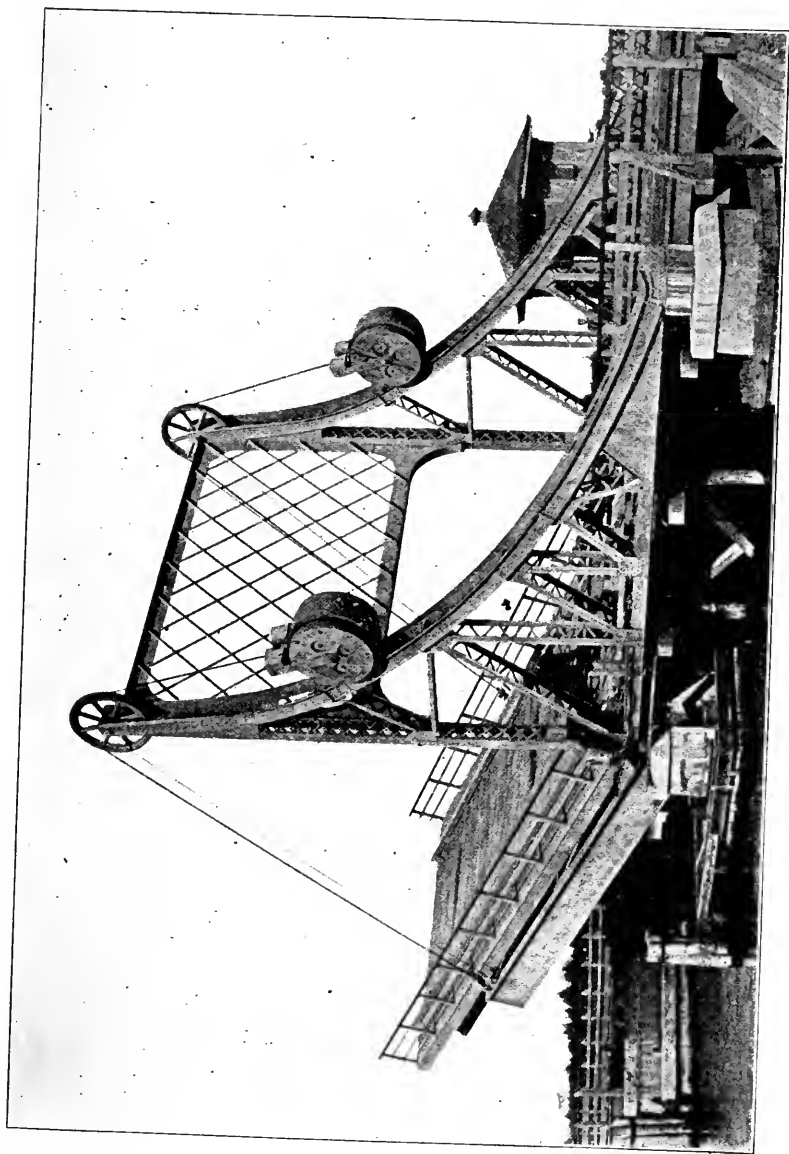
Harway Avenue Bridge, Brooklyn, N. Y.
